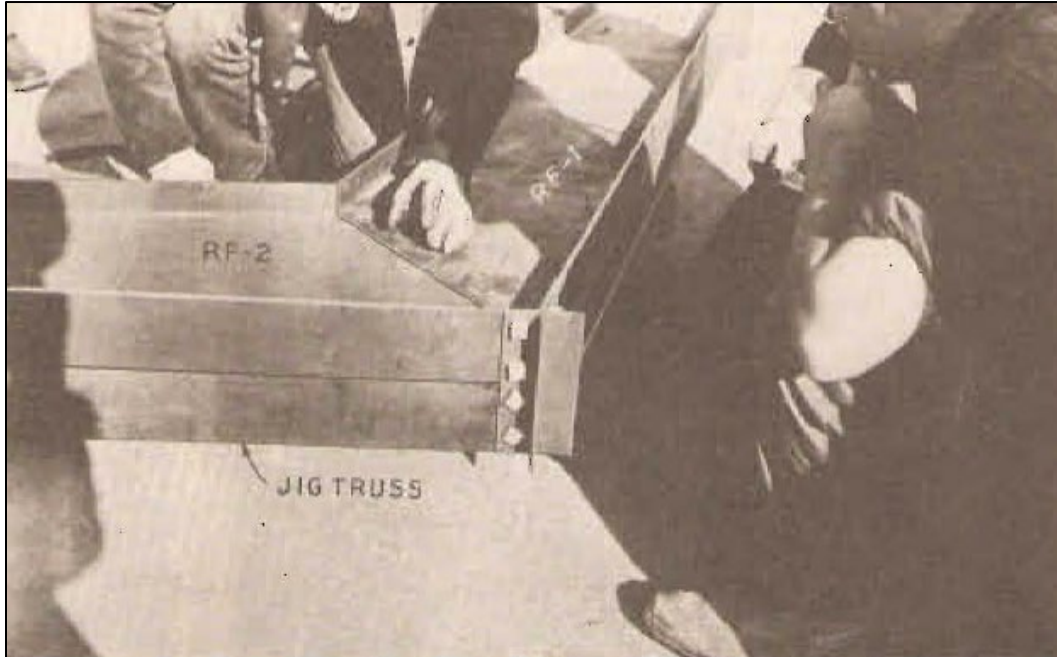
A completed connection between two metal frame members after being removed from the welding jig (Butler Manufacturing Company, "U.S. Navy rigid frame utility warehouse building erection instructions for the 40'-0" x 100'-0" building," Kansas City, MO: Butler Manufacturing Company, 1945).
